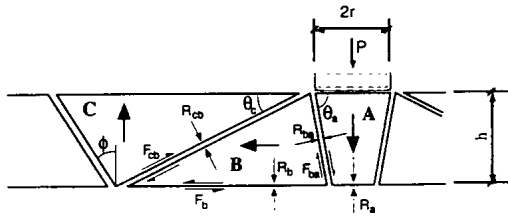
Proposed 'wedge model' for calculating rutting in pavement foundations (after Thom et al, 1993)
